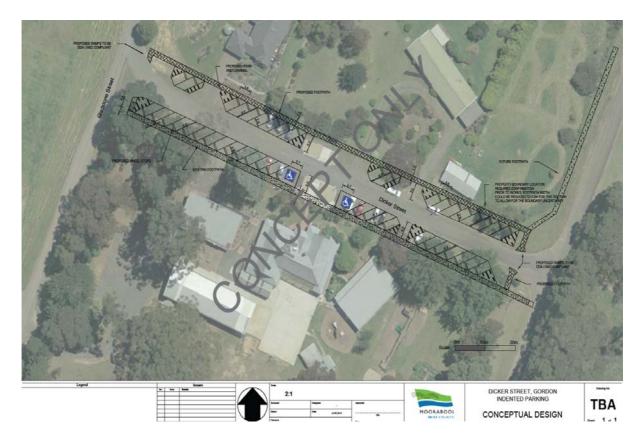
Proposed 'Parking Strategy' at Dicker Street, Gordon
